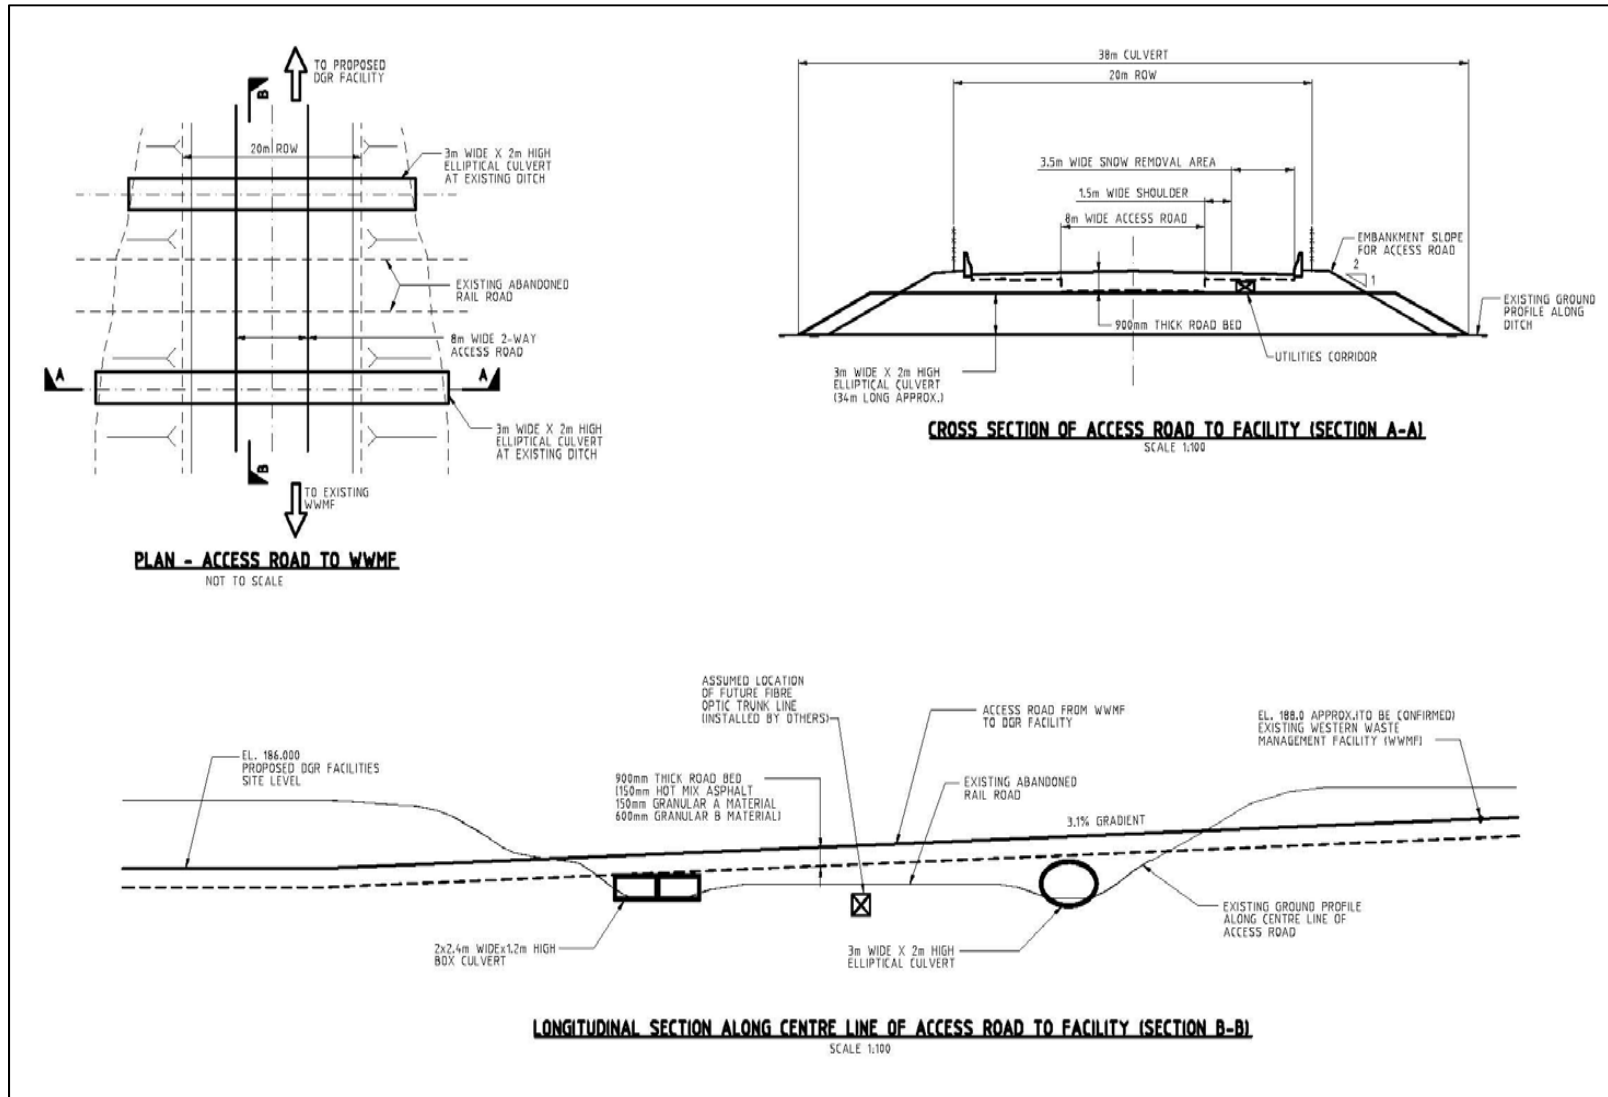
General Layout of Crossing from the WWMF to the DGR
